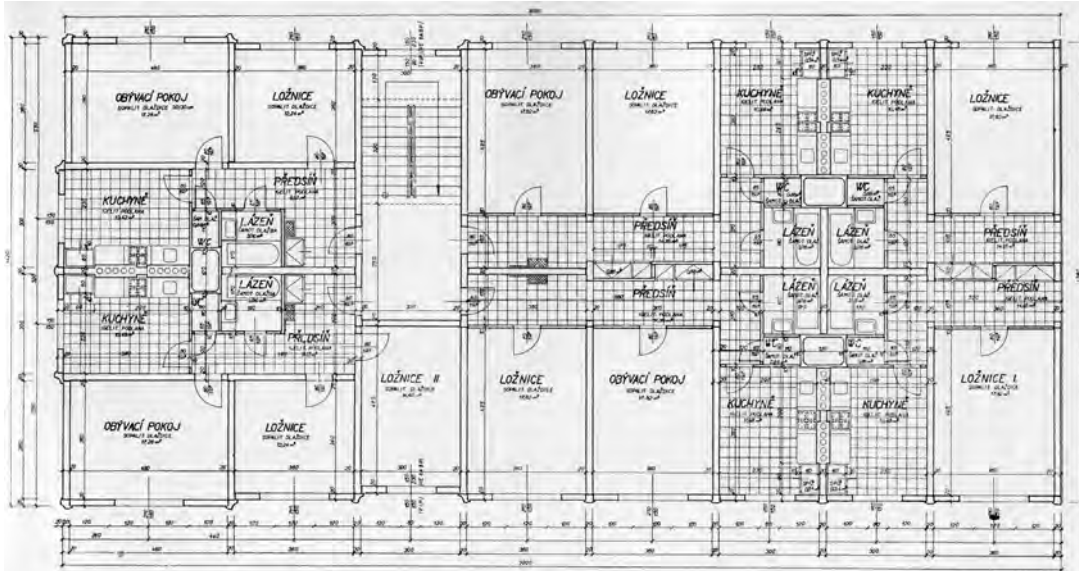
BOHUMIL KULA AND HYNEK ADAMEC, PLAN OF G40 BUILDING, ZLÍN, 1954.
